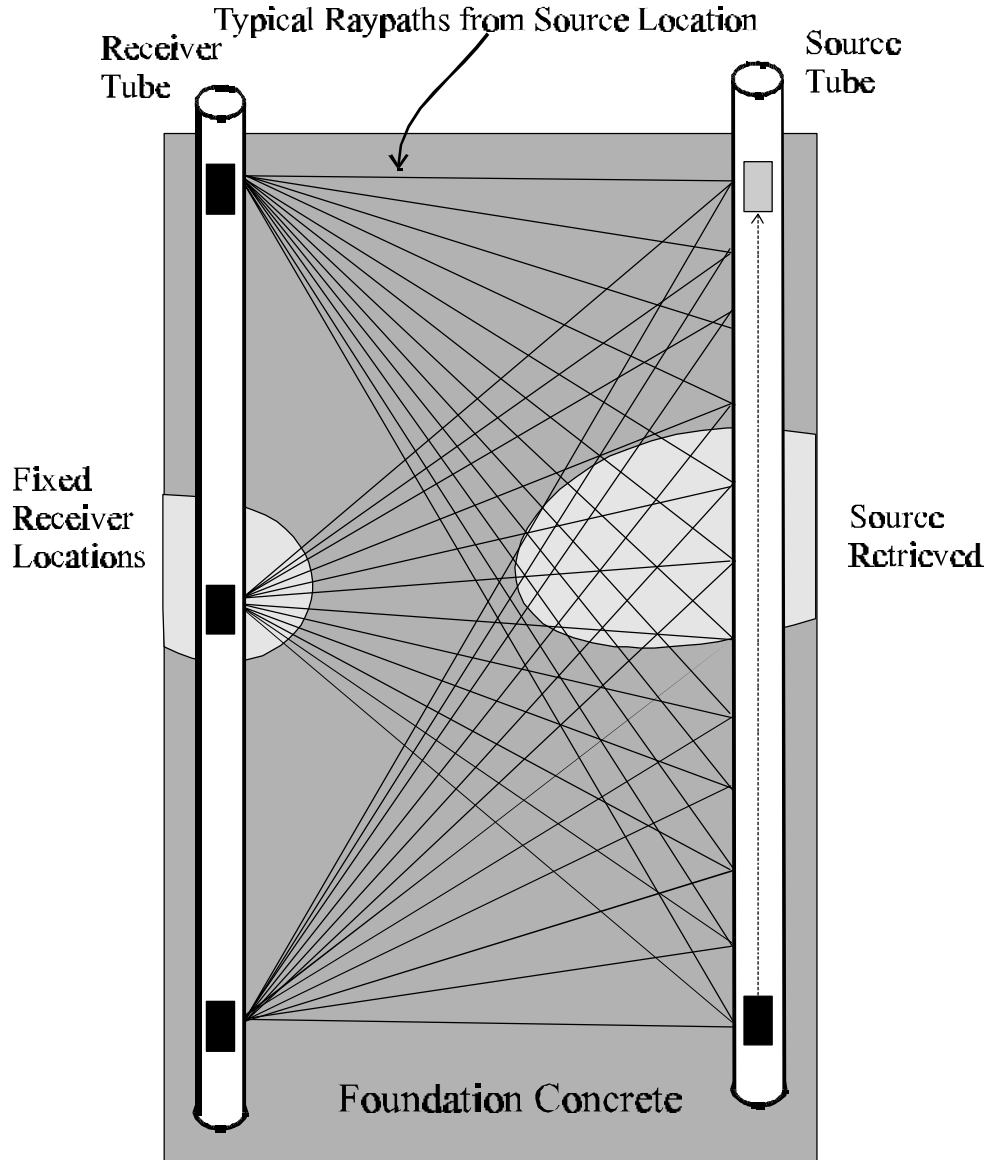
Crosshole Tomography Setup between Two Tubes of a Drilled Shaft.
